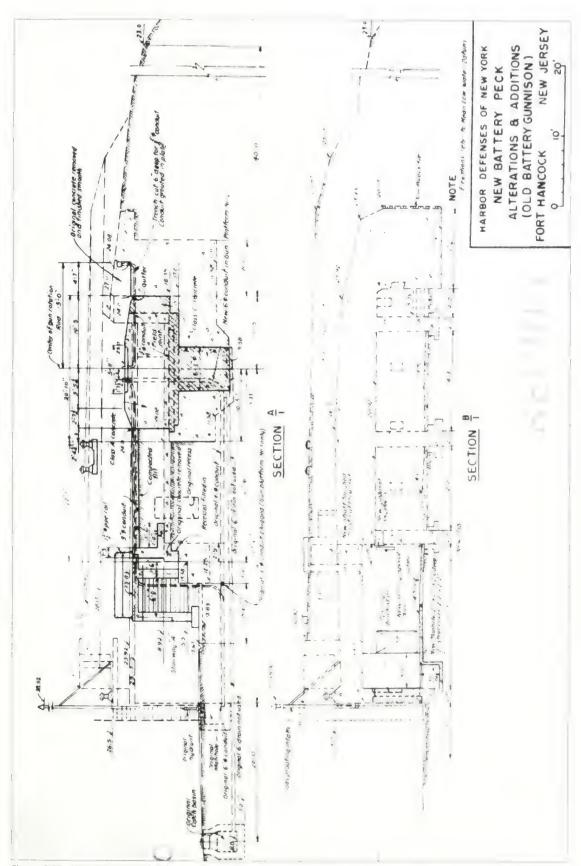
New Battery Peck, Alterations & Additions (Old Battery Gunnison), 1943. In order to mount Battery Peck's guns at Battery Gunnison, a redesign of the platform area was required. At the base of the parapet wall, the platforms had concrete added in order to create a level surface for mounting the guns. Once the new guns were installed, Battery Gunnison was designated New Battery Peck (Report of Completed Works, CDSG ePress).
